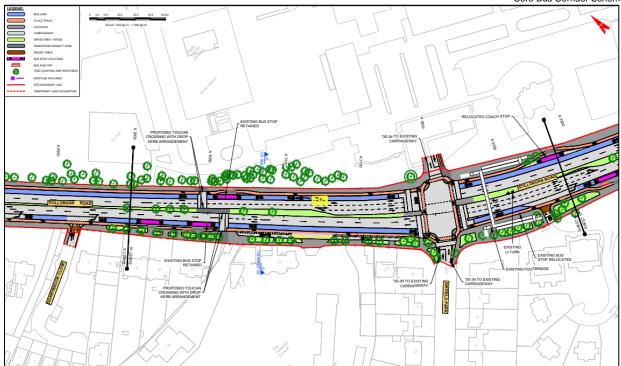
Extract from General Arrangement Drawings at Beaver Row to Nutley Lane (Sheet 10)
